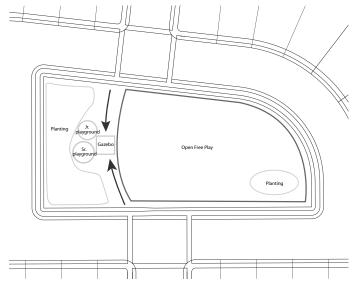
Typical Upgraded Neighbourhood Park Plan
